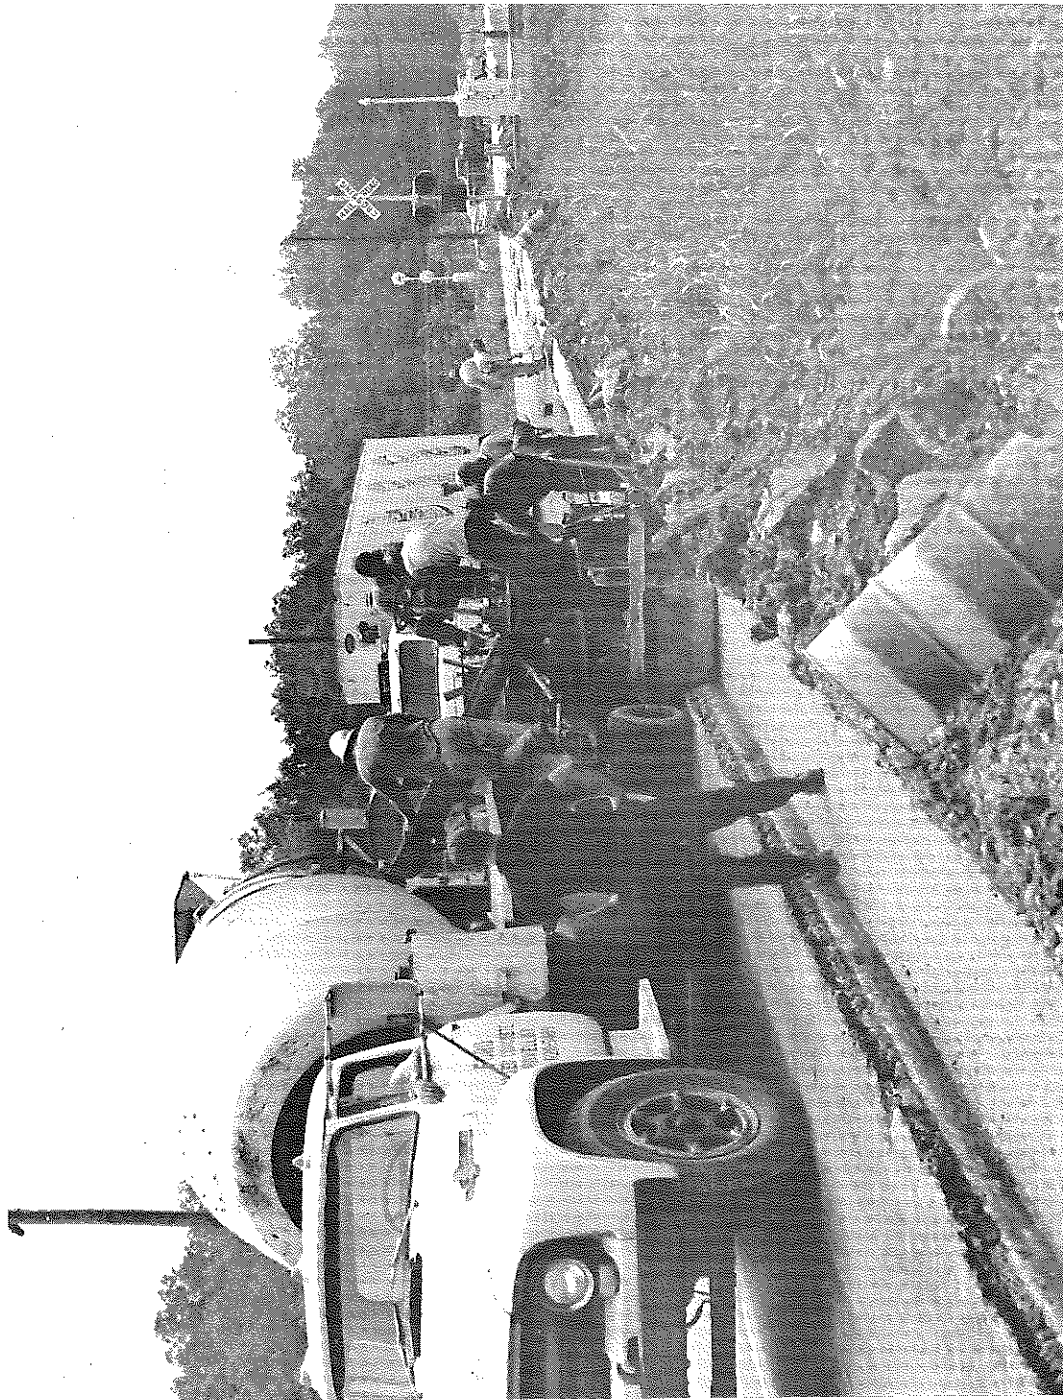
Slip-Form Paver Used for Pavement Widening on US 51 between Bardwell and Wickliffe, June 1965.
